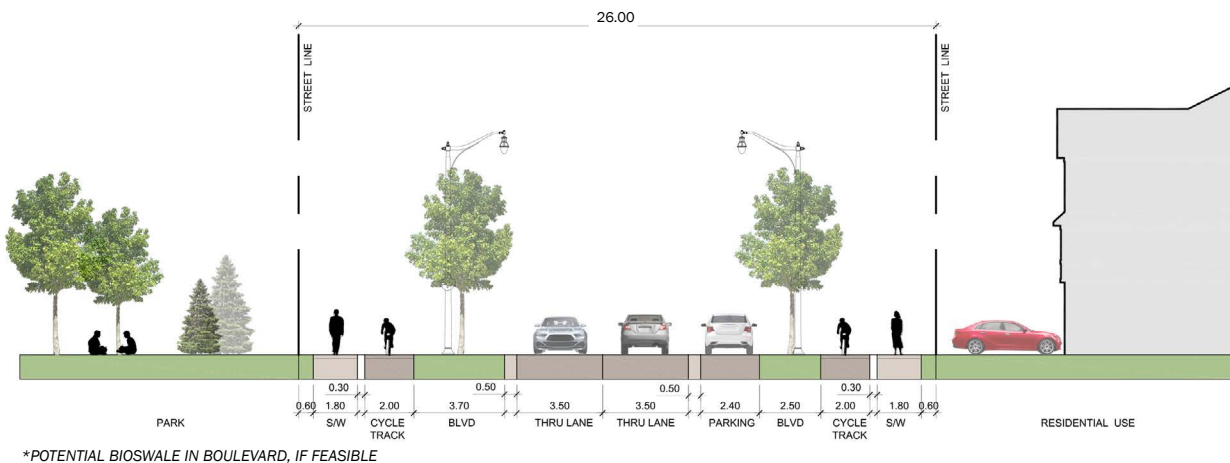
26.0m Collector Street “A” & “B” Cross Section through Compact Residential Area - With On Street Parking.
